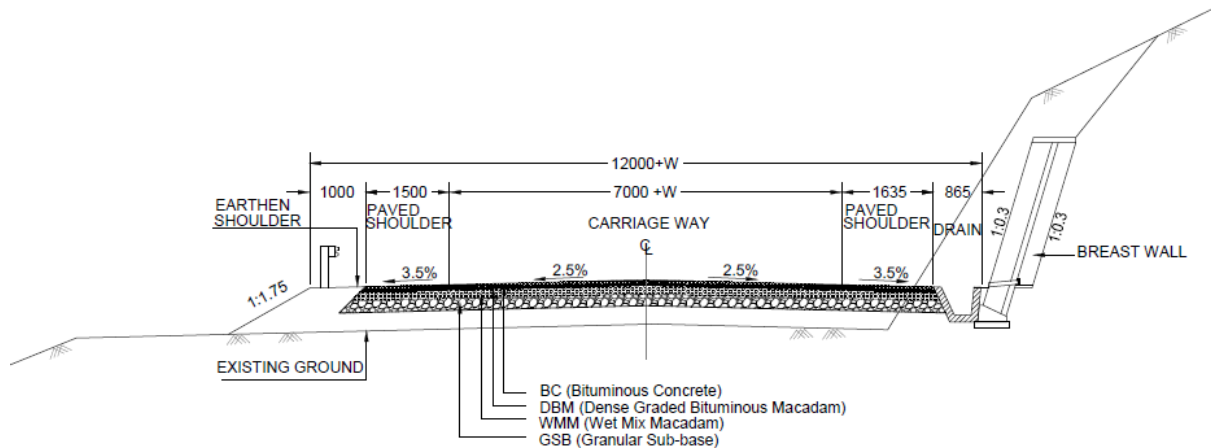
(7): Typical Cross Section – Pavement Structure in Widening Primarily to Hill Side
